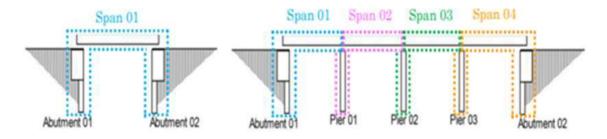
Common bridge-type units as indicated by span number Echaveguren and Dechent (2019)
